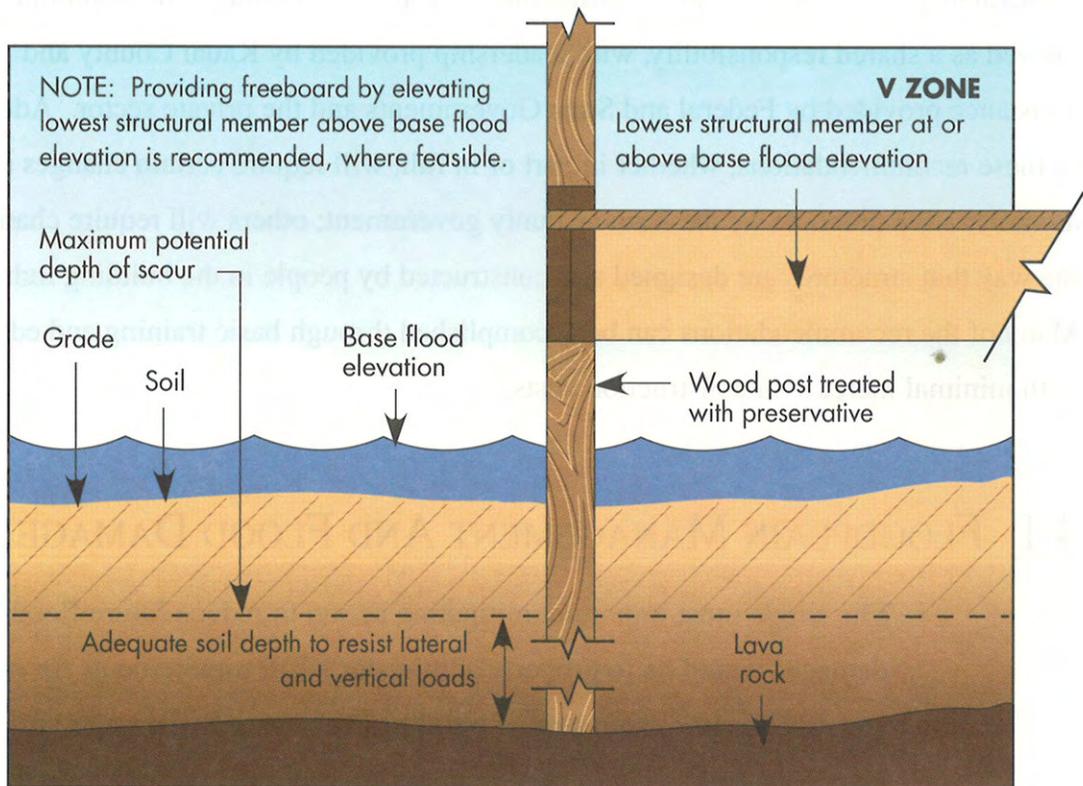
NFIP requirements for elevated foundations in V zones.
